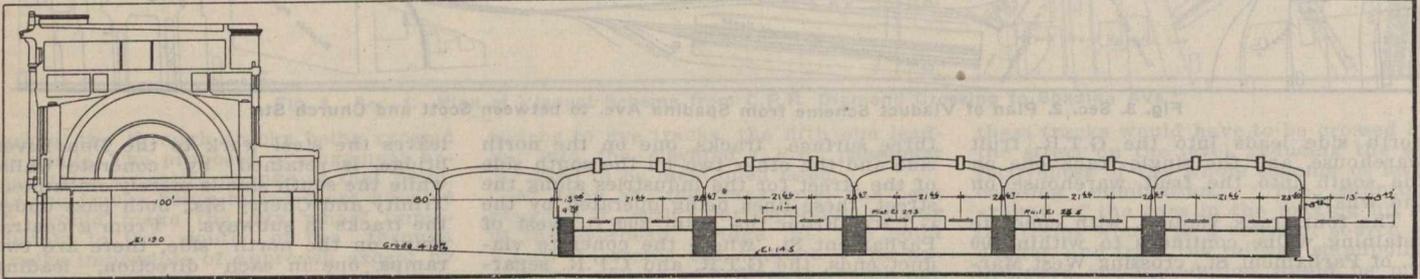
Cross Section through Union Station and Passenger Subway under Tracks, showing Interior Arrangement.
